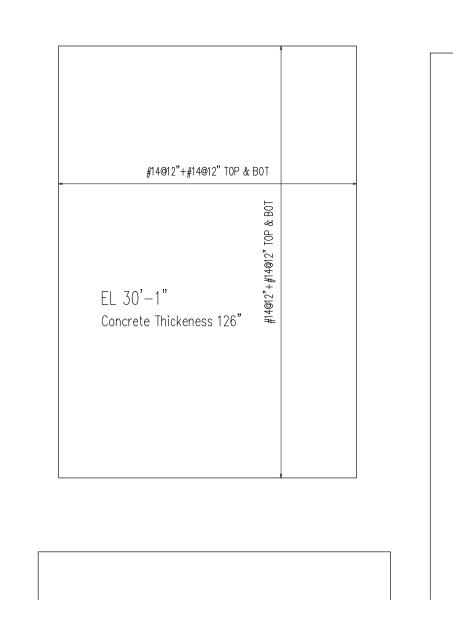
Typical Reinforcement in Spent Fuel Pit Slab – AREA 3
